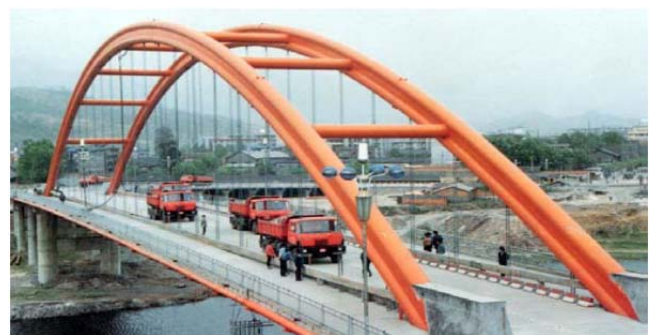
First CFST Arch Bridge in China: Wangchang East River Bridge (Span 115 m)
